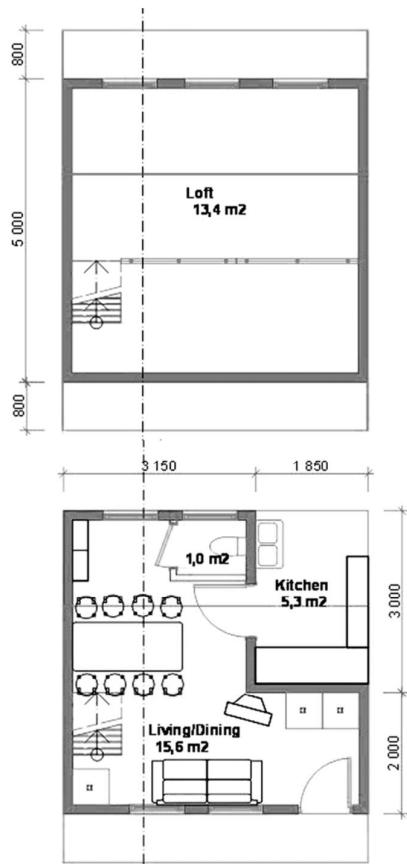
Above: First floor of Villa Eva. Below: Ground floor of Villa Eva
